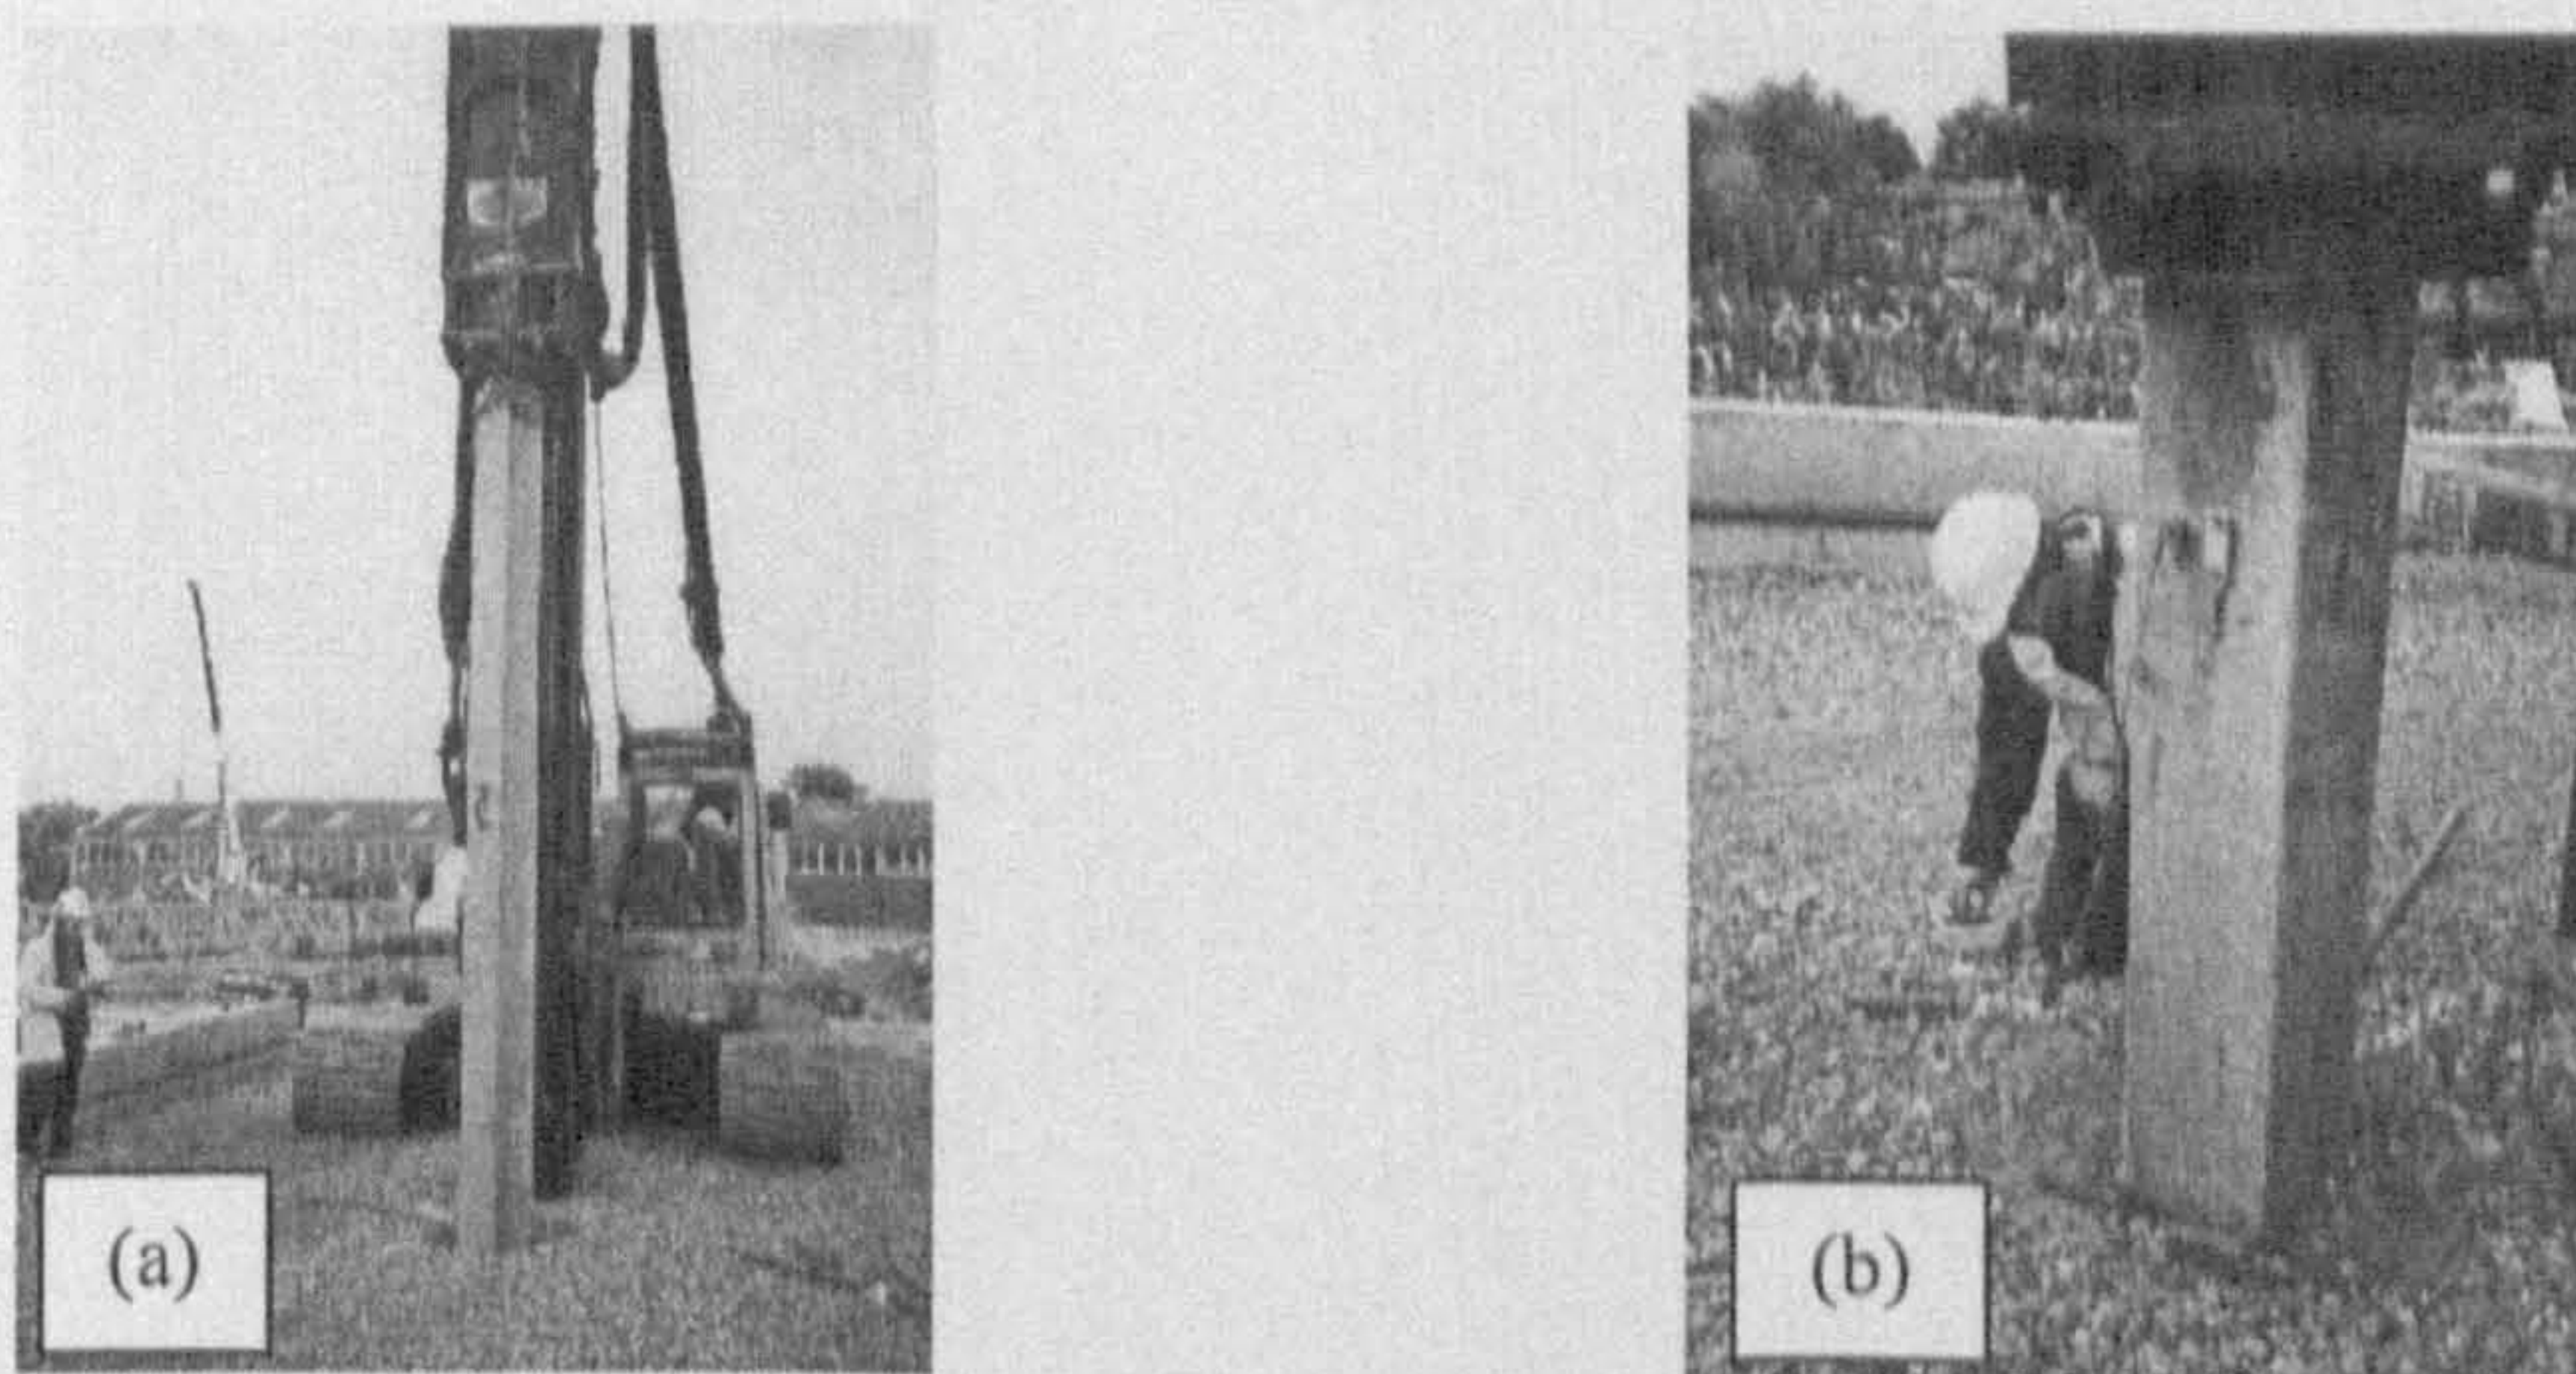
, (a) Driven pile installation prior to dynamic load testing, (b) Installation of instrumentation to a precast concrete pile for dynamic pile load testing.
